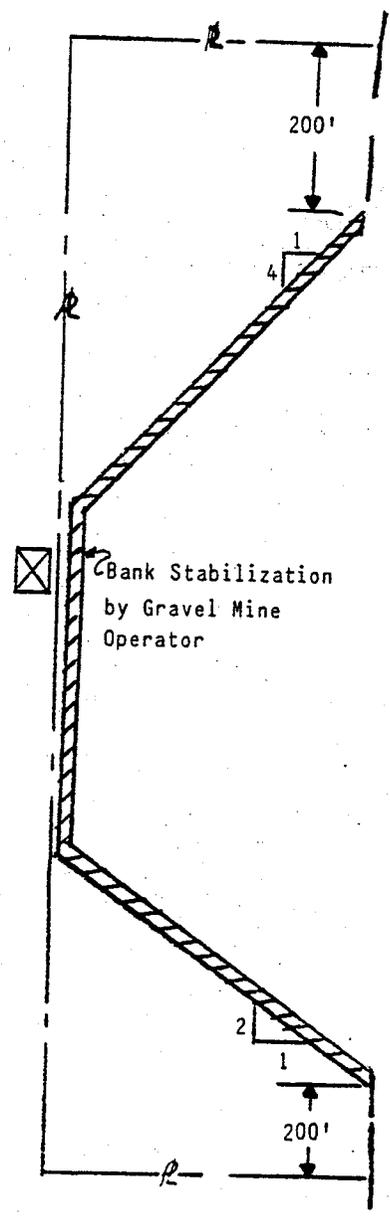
Limit of Excavations Downstream of a Hydraulic Structure.
